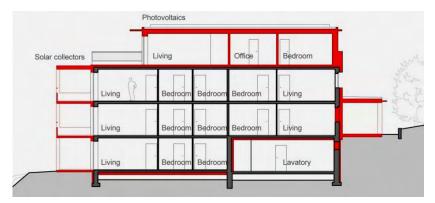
Vertical section of building. New parts in red (new balconies to the South, additional penthouse apartment, building annex for new heating system
